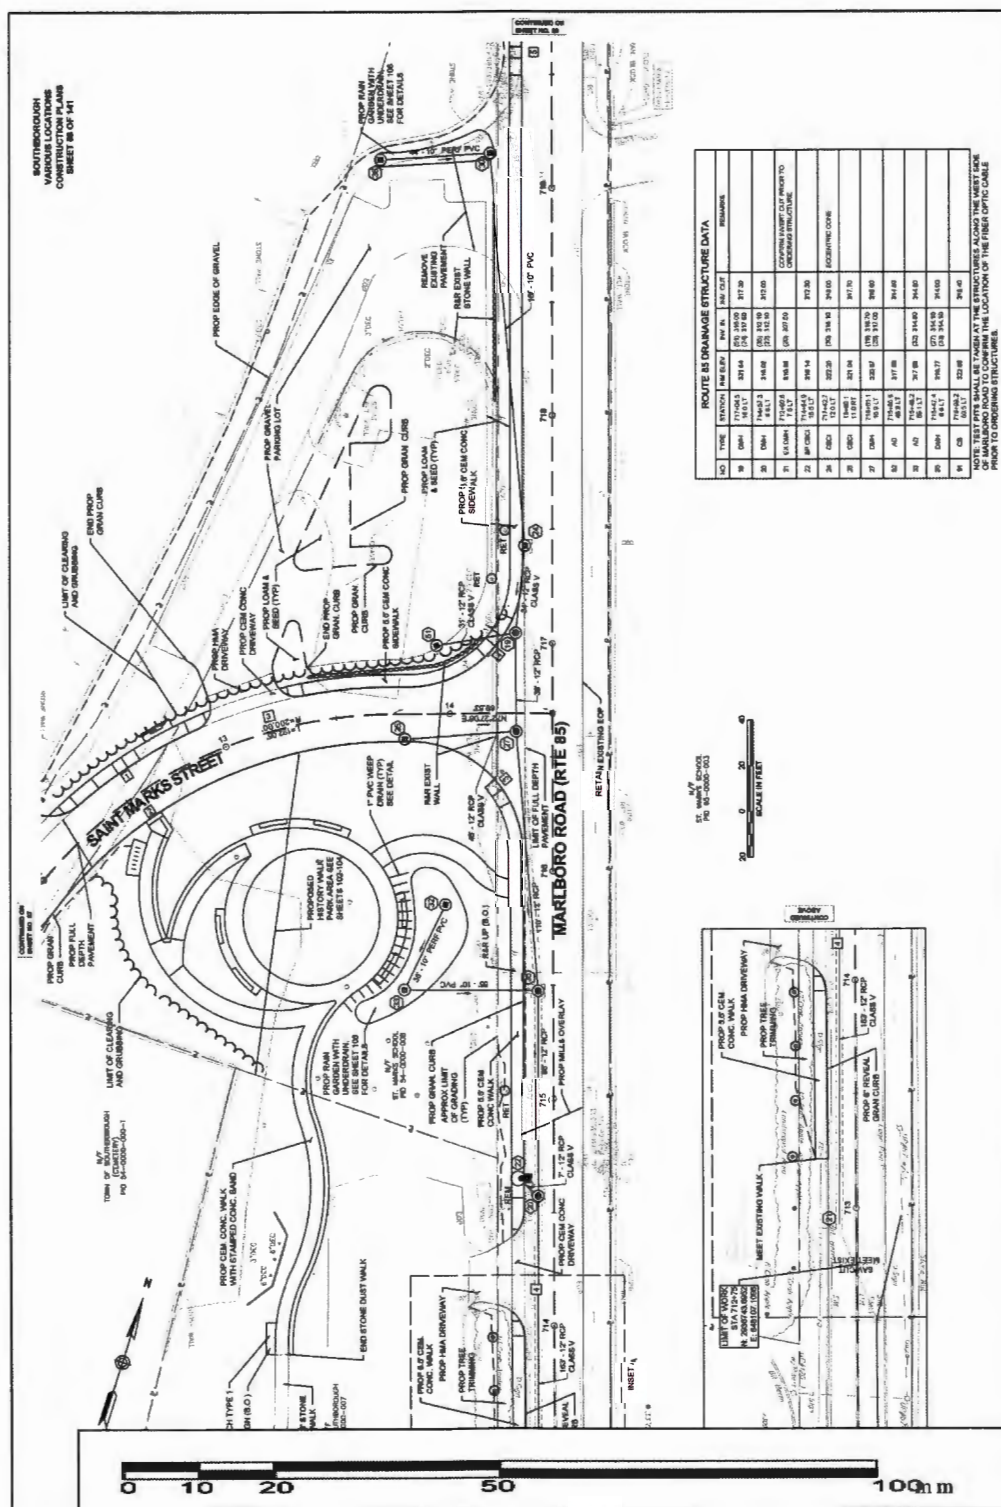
Site Plan. Scale 1 mm = 1 m (1:1,000).
